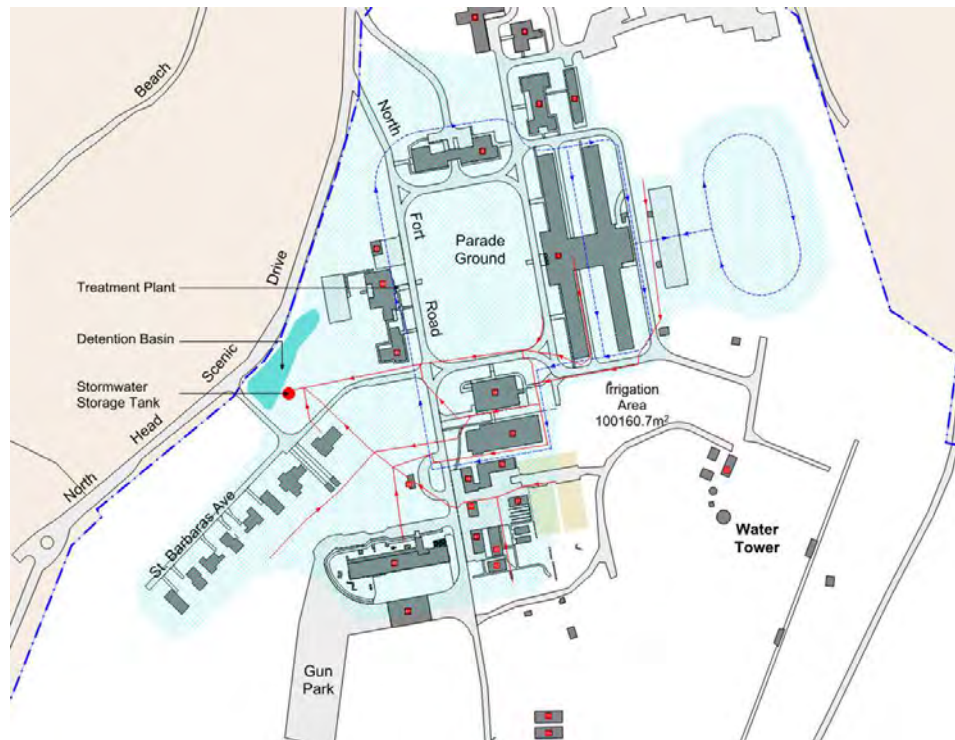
Plan of existing drainage infrastructure in the north of the site – NH.00-Services-Master-Plan-Draft-20210510
